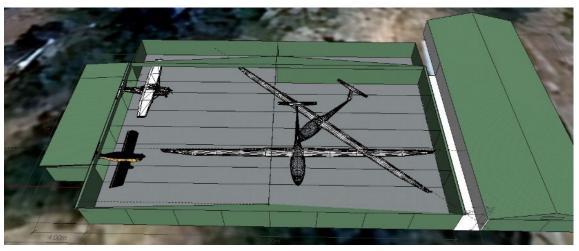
Possible layout, Note the 23 metre wingspan glider inside with a small plane
